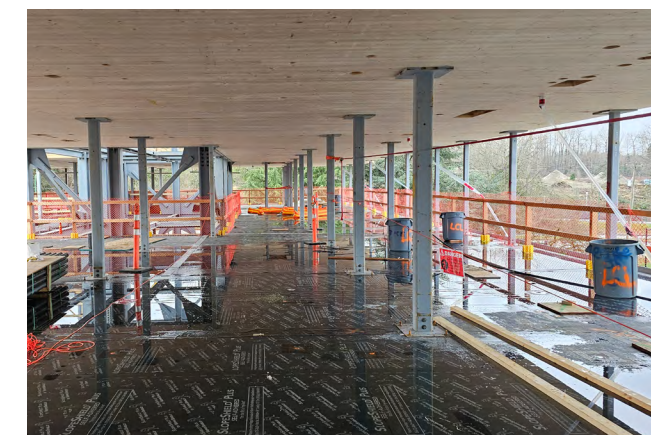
A mass timber floor exposed to rainwater during construction. A membrane is installed over full panels to reduce moisture-related risks.
